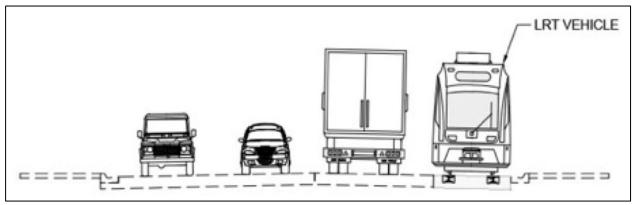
LRT Typical Section - North Miami Ave At Grade
